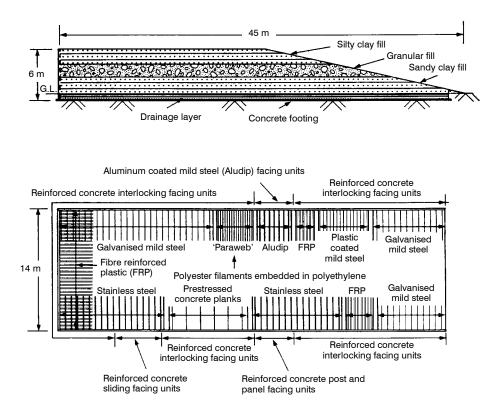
Transport and Road Research Laboratory (TRRL) experimental reinforced wall (after Boden et al. 1978).
